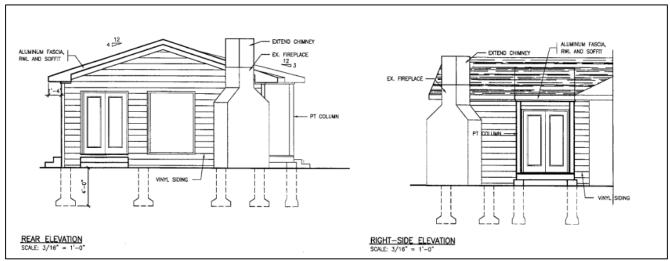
Rear and side elevation of the proposed rear yard addition.
